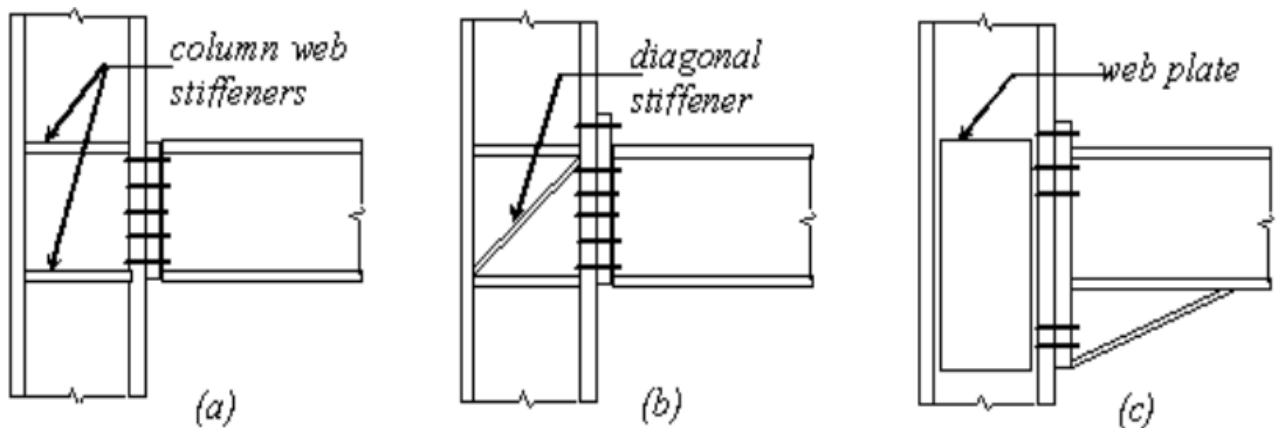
Rigid beam-to-column connections (a) Short end plate (b) Extended end plate (c) Hunched
